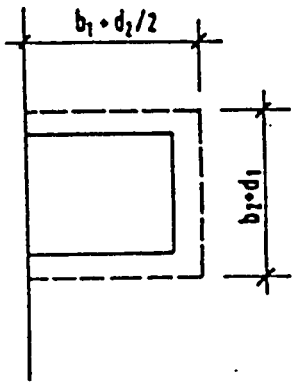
Column Connected to Slab at One Face Only (Regan and Braestrup 1985)
